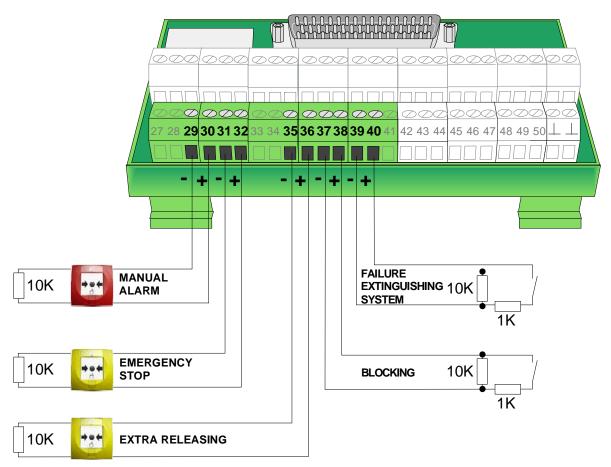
Connecting the technical zones at the external zone terminal card (type Phoenix / Weco)
